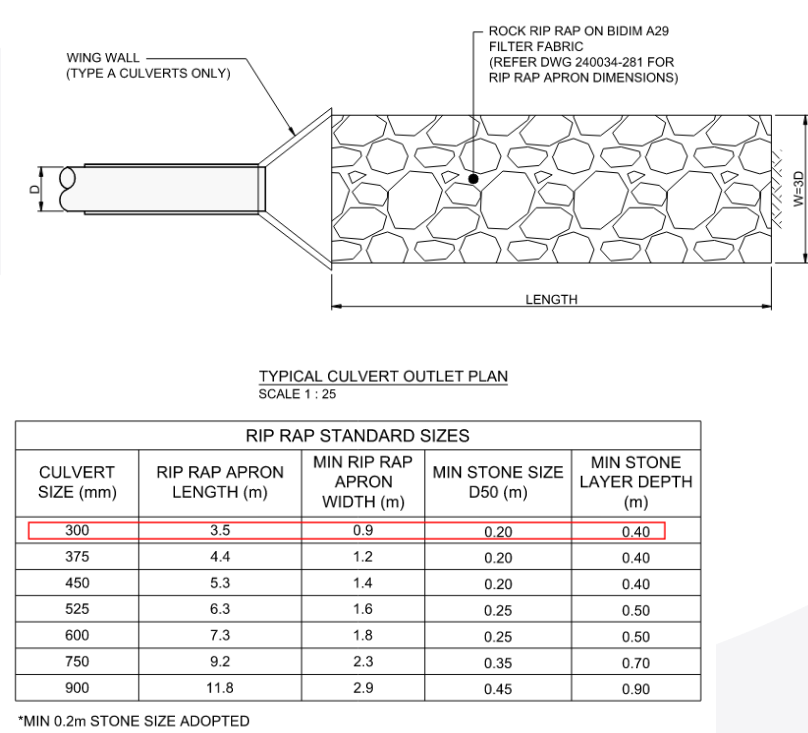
Typical substation stormwater outfall details (Excerpts from Riley Dwgs 240034-281 and 282)
